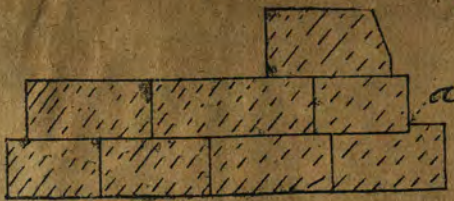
shows a cross section of part of the Camp Wall near the north-west corner, and is the best-preserved bit that has been found in any opening made. The foundation course shows a large "scarcement" both outside and inside of the wall, and the outside stones of the second course are received into a notch in the foundation stones. This notch appears to have
